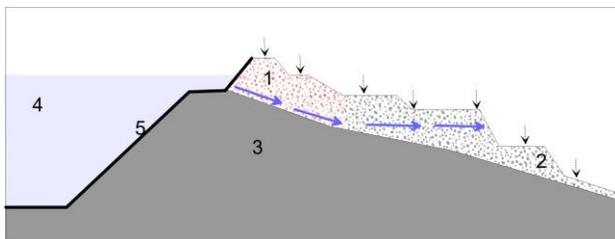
Dam scheme: 1 – thawed rockfill material; 2 – frozen rockfill material; 3 – frozen foundation; 4 – tailing; 5 – damp-proof membrane; black arrows – ERI profiles.
